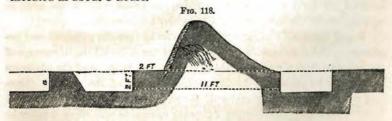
is a profile adapted to marshy or rocky situations where shallow trenches only are practicable.
